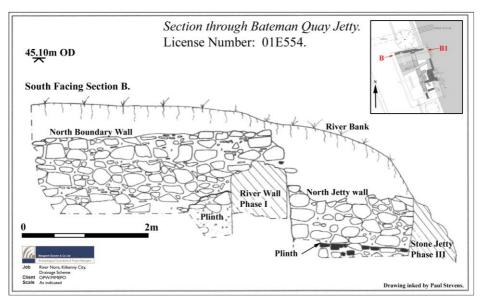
Section of walling Bateman Quay jetty after MGL 2001
